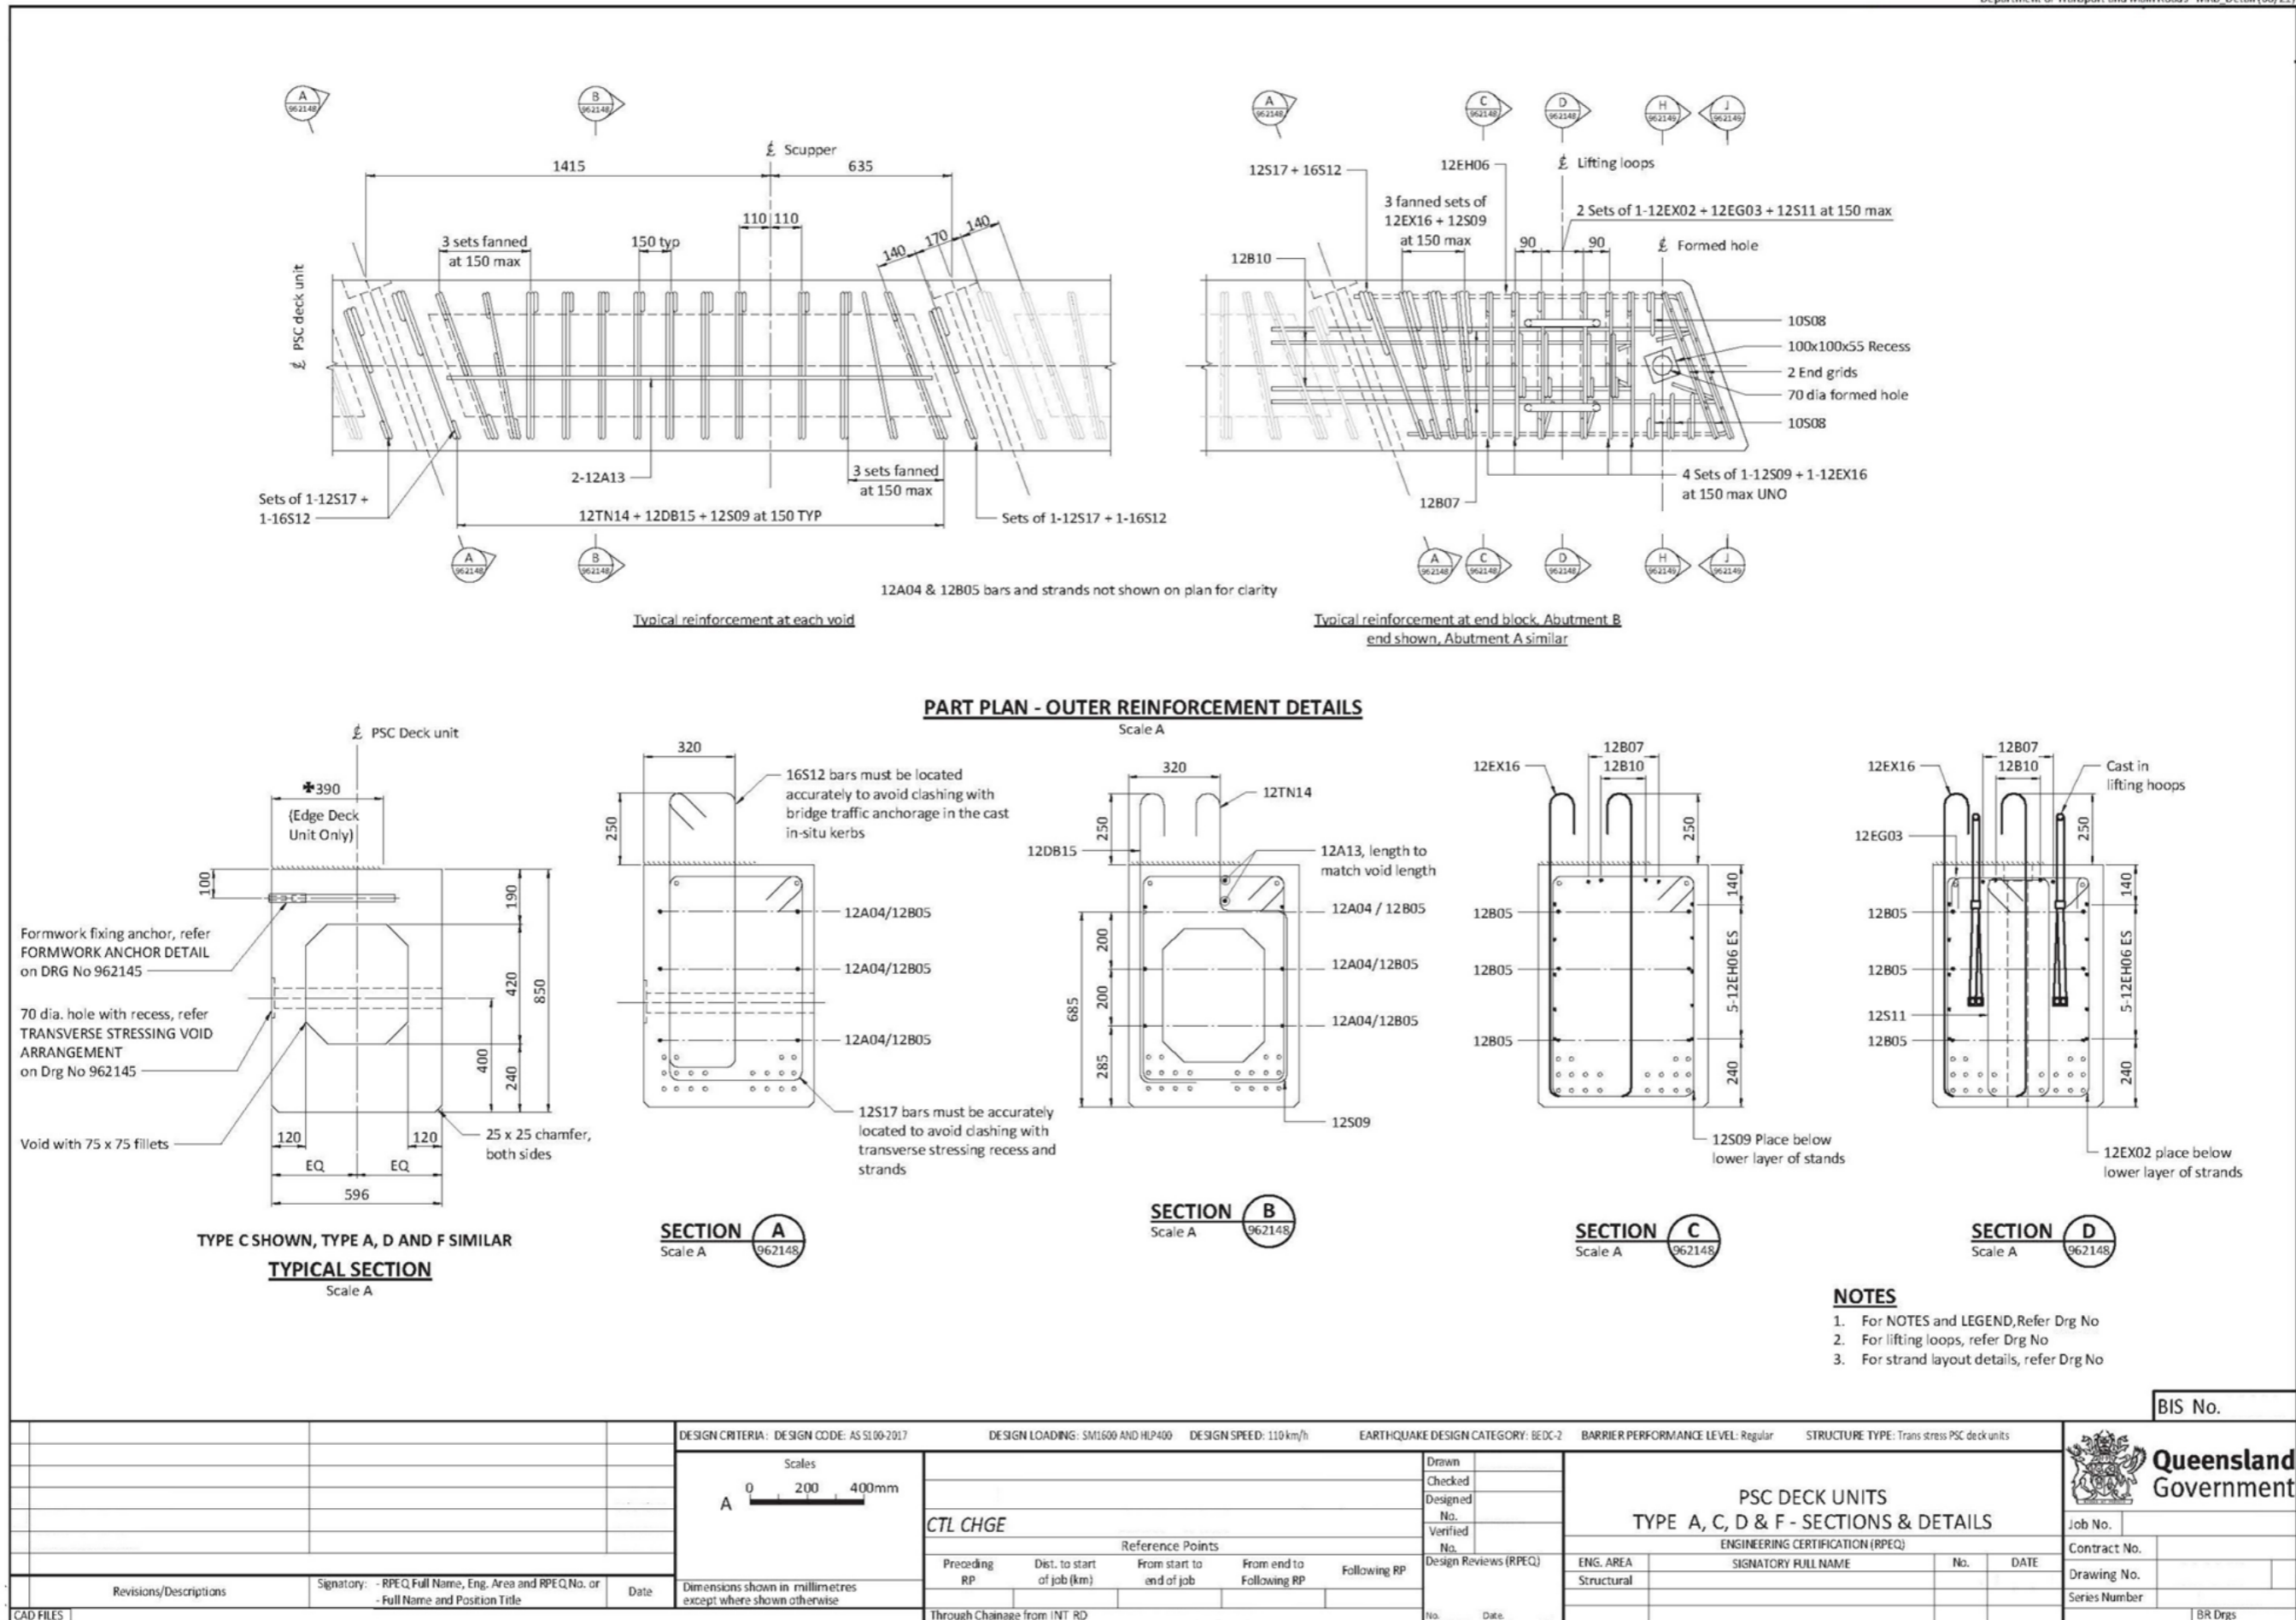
(g) - Example deck unit with reinforced concrete deck bridge drawings - Sheet 1
